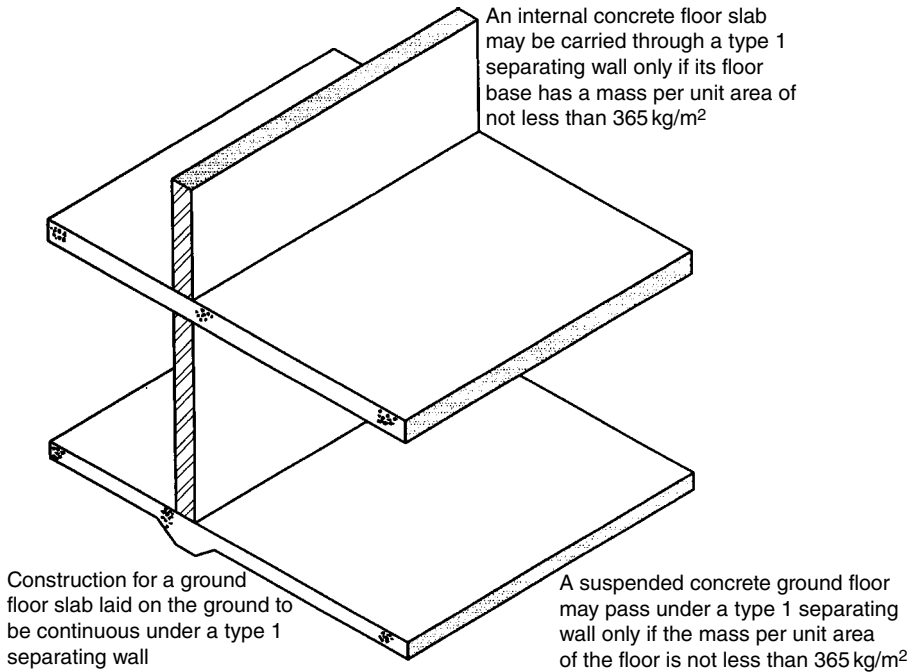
Conditions for concrete floors to pass through Type 1 separating walls.
